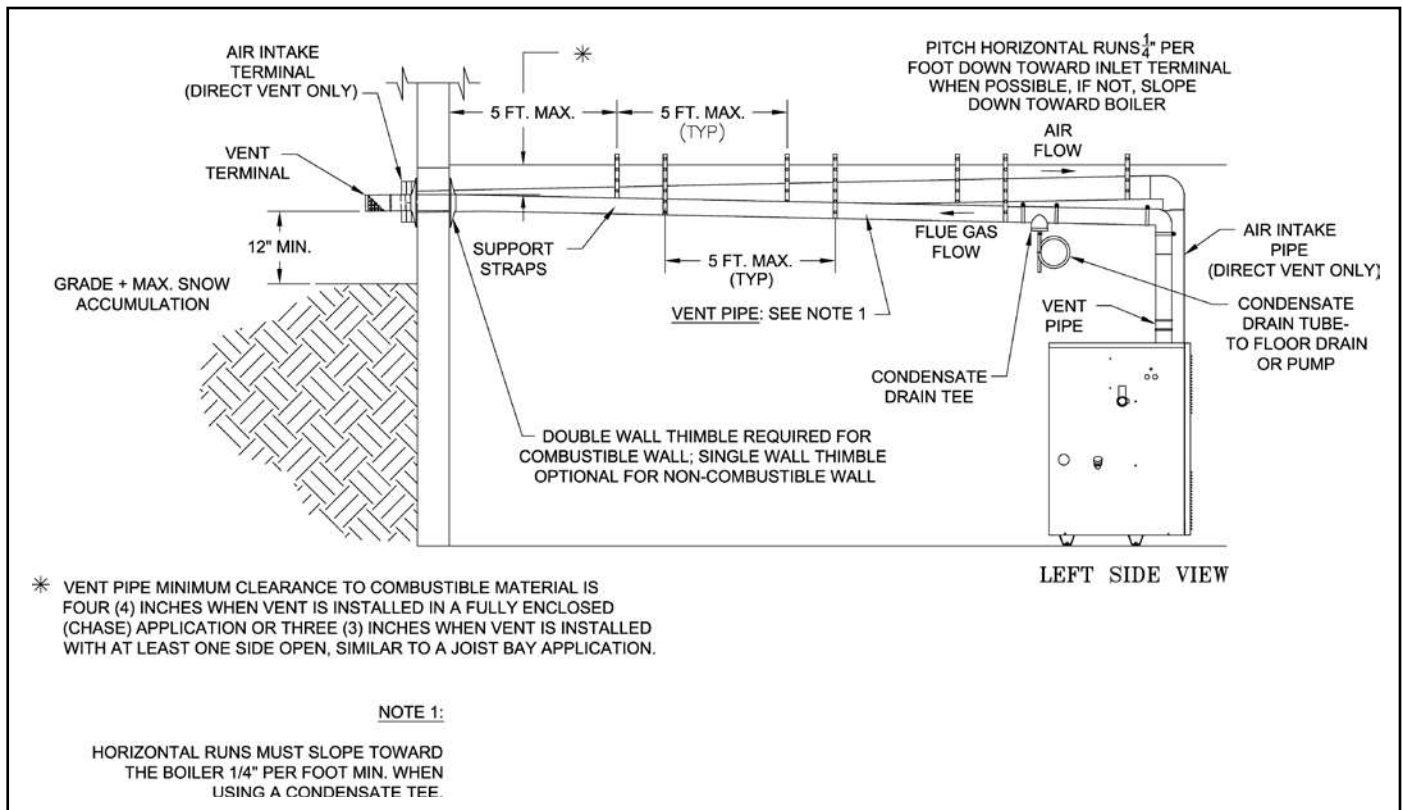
Alternate Separate Horizontal – Vent/Air Intake Installation
